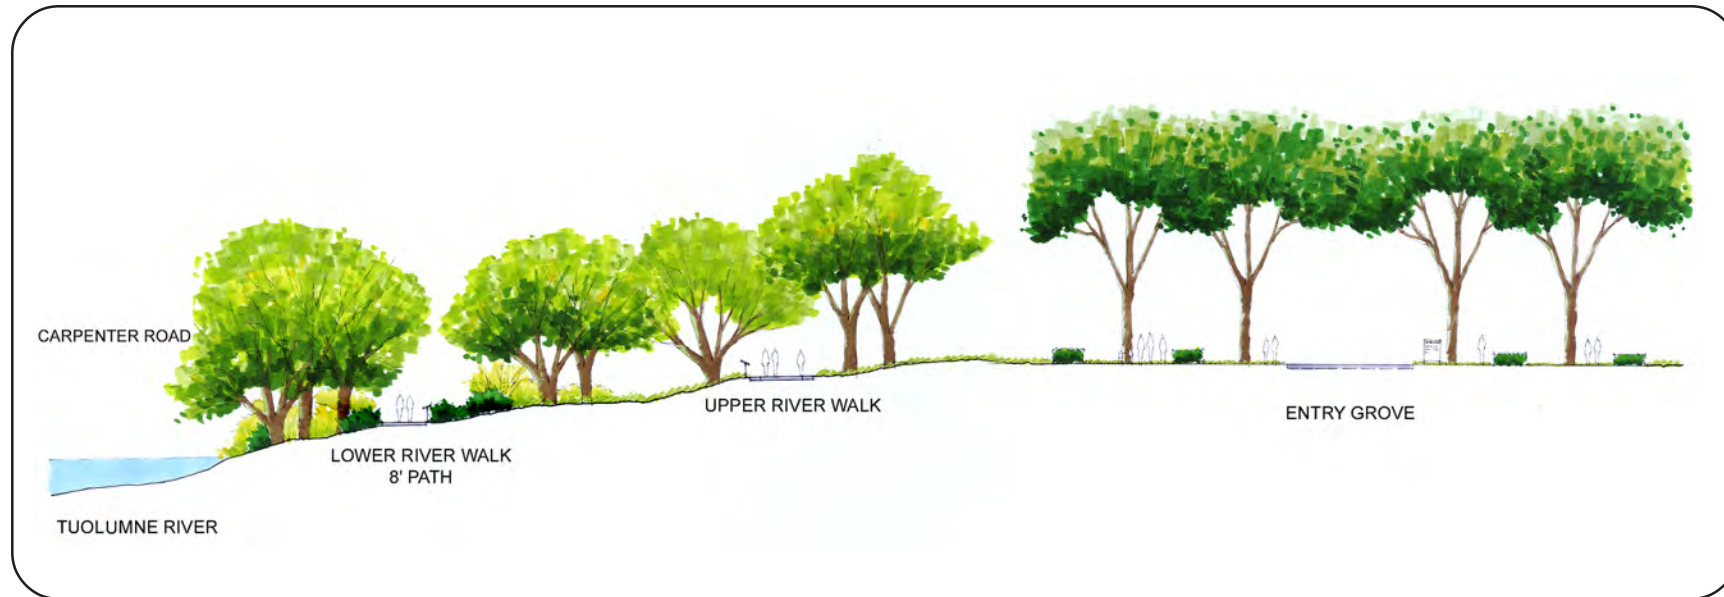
Carpenter Road Area - Illustrative Cross Section A
